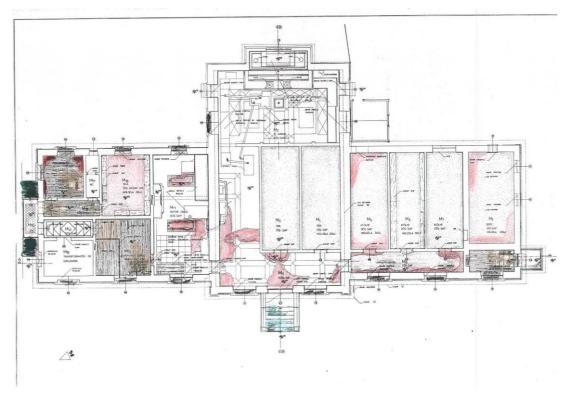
3. Cendere Water Pump Station Plan (Kaya, 1998)
